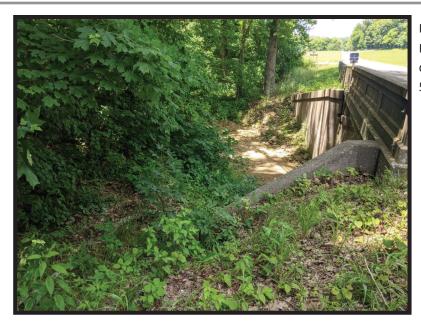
Looking west at RSD2 from southeast quadrant of Bridge (158) 58-47-03027. 6/14/2021
